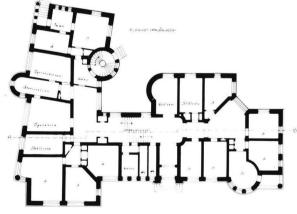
First-floor plan of the Laivurinkatu side and second-floor plan of the Tehtaankatu side, final drawings from 1904. Patients' rooms on the Laivurinkatu side, operating theatre on the Tehtaankatu side. (HKRVVA).
